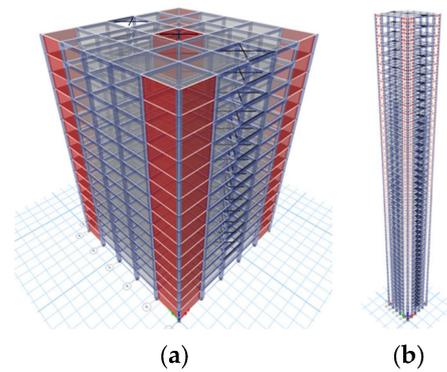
(a) G + 15 Framed Structure without shear wall Opening 3D Model; (b) G + 50 shear wall with opening 3D Model Case-1.
